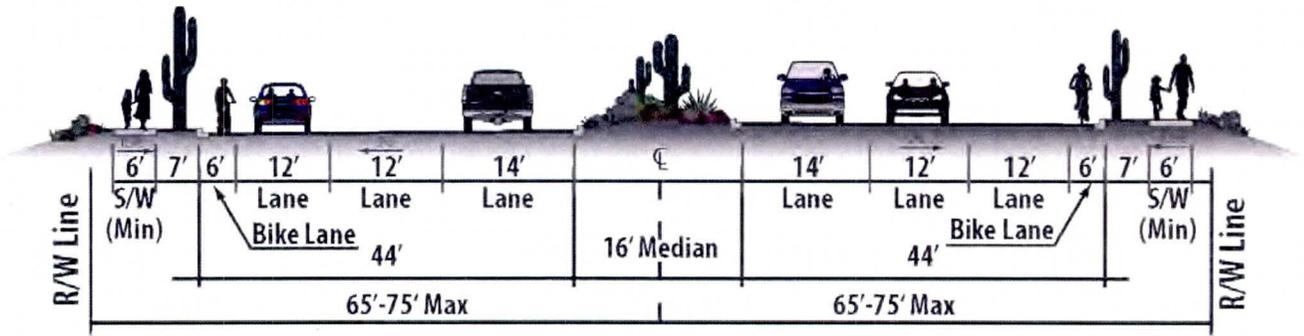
Ultimate Roadway Cross Section – Southern Avenue to Germann Road
